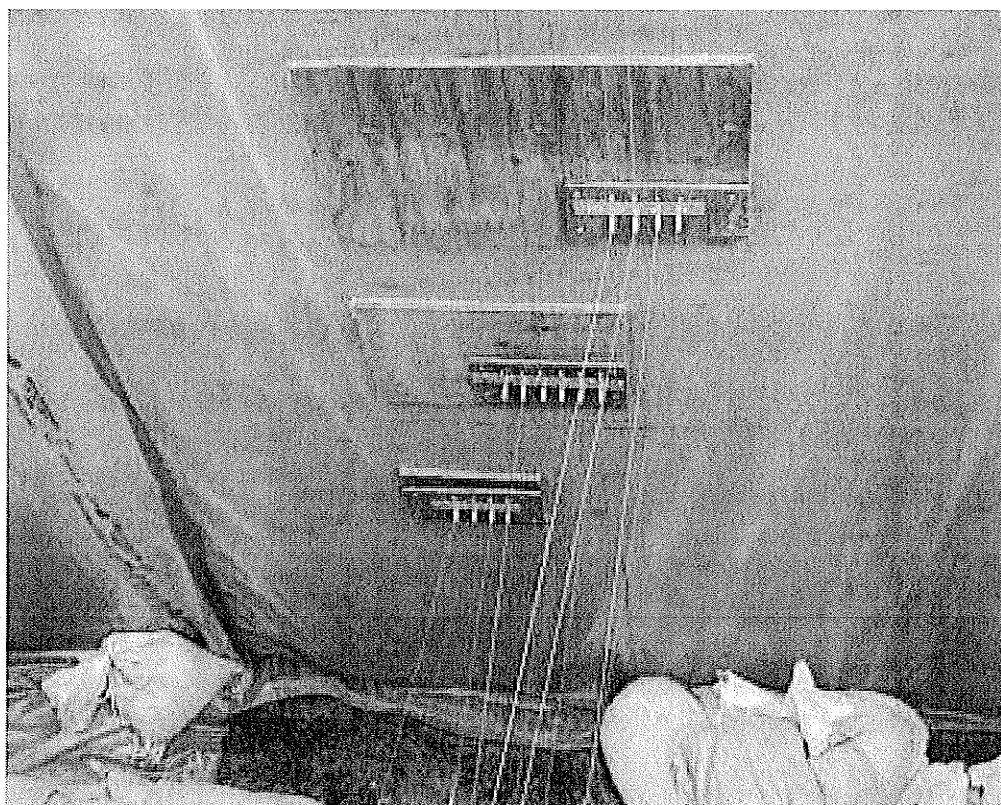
Extensometer Pulley System mounted on Flume wall with Cables attaching to Sandbags in Dike (not shown – foreground).
